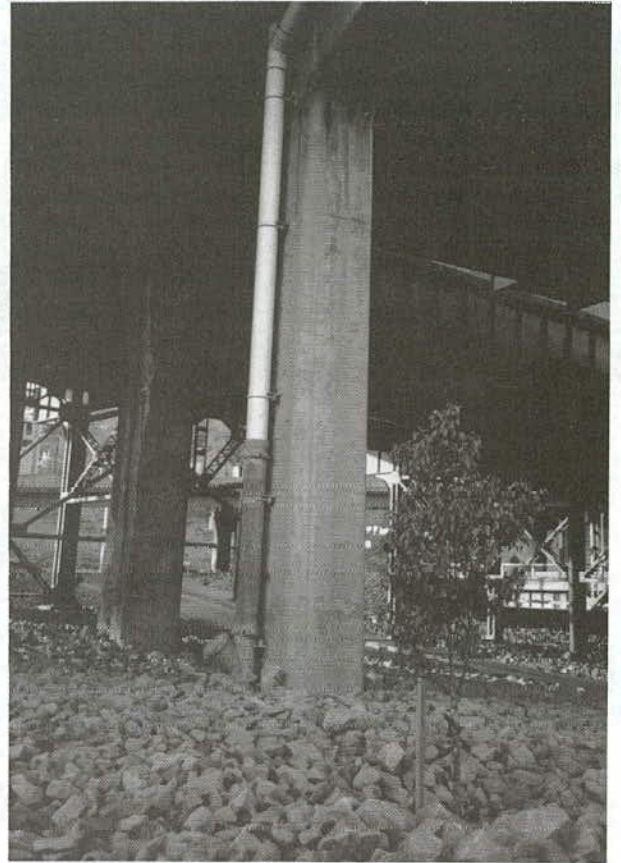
Large-diameter (10-in.) bridge drainage pipes and plastic sheeting and stone ballast reduce maintenance at major Interstate elevated exchange (12-in. galvanized steel pipe used from ground level to 10 ft to prevent vandalism; 10-in. PVC piping used above 10 ft).
